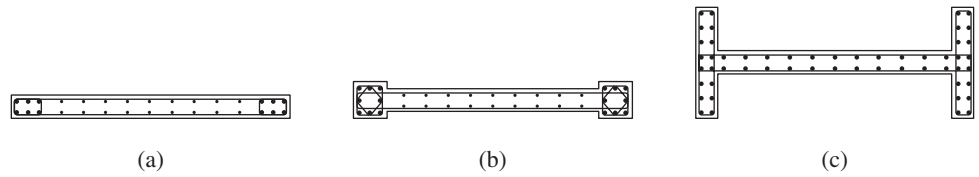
Structural walls with boundary elements (a) Rectangular wall—boundary element has the same thickness as the wall (b) Rectangular wall with enlarged boundary element (c) Flanged wall
